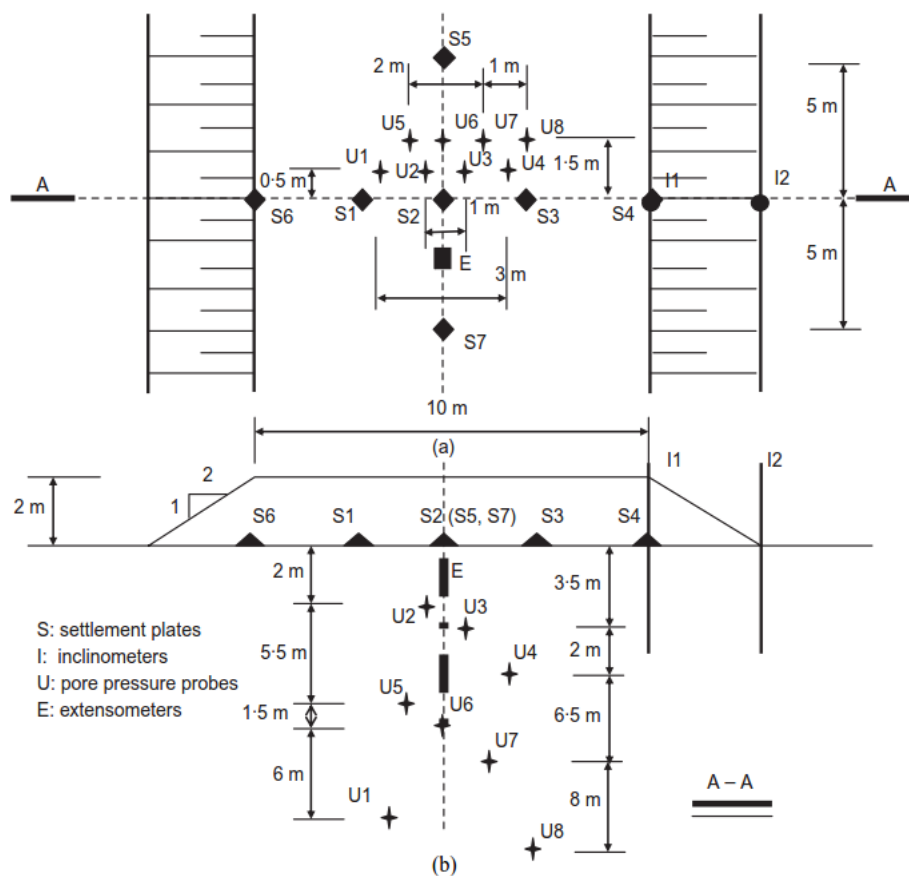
Murro test embankment with details of instrumentation: a) plan and b) cross-section (Karstunen and Yin 2010).
